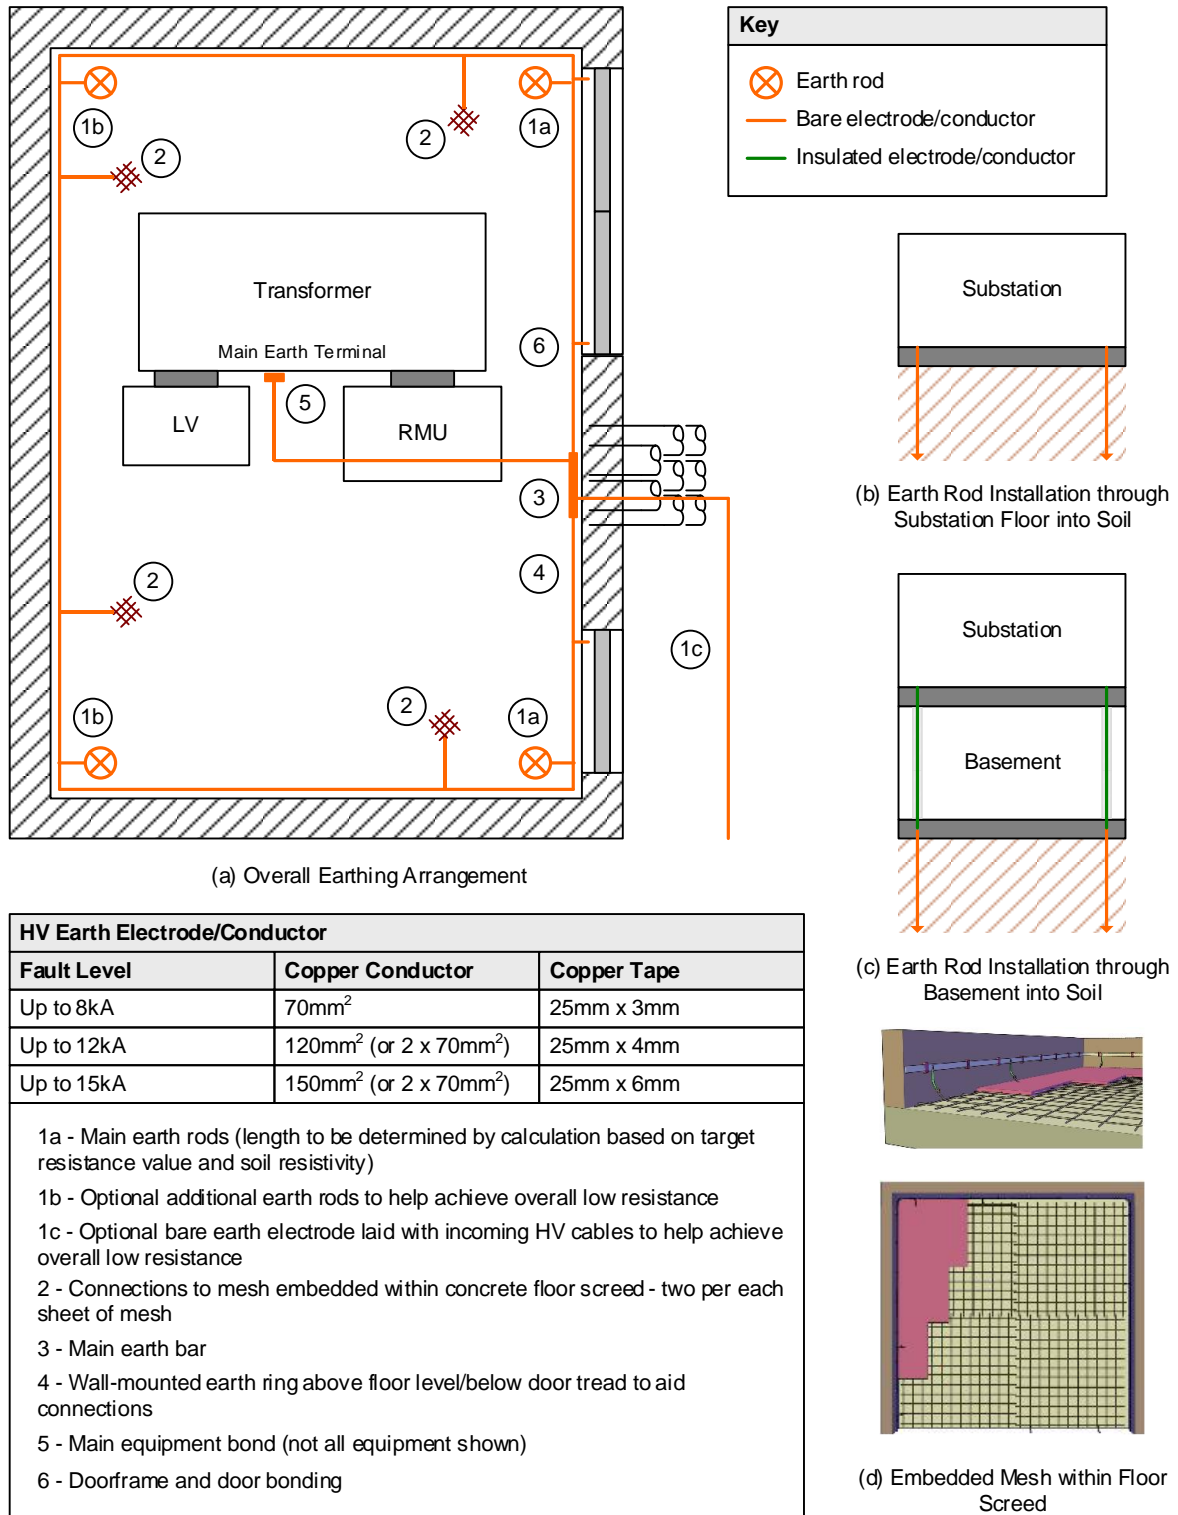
Standard Design Approach for Integral and Basement Substation
